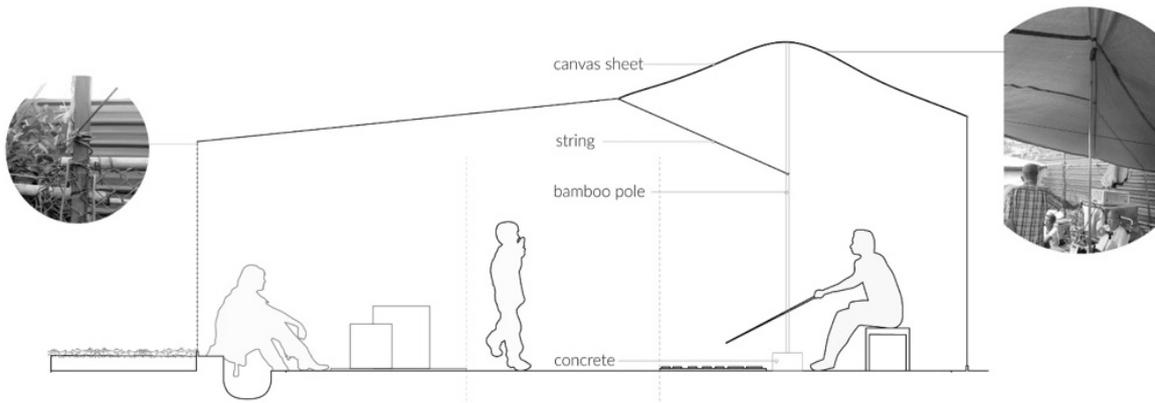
Section drawing – Shelter structure Type 1 (Illustration: Liaw Su Xin)
